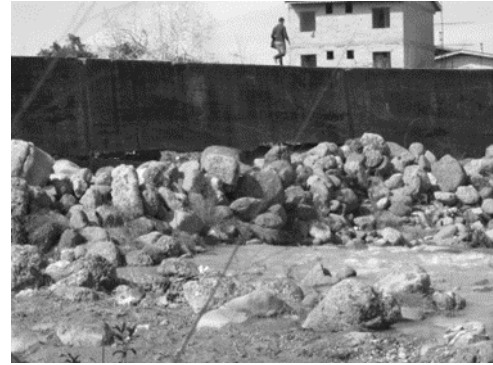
Concrete wall in downstream of Kalachay Bridge at the left bank side
